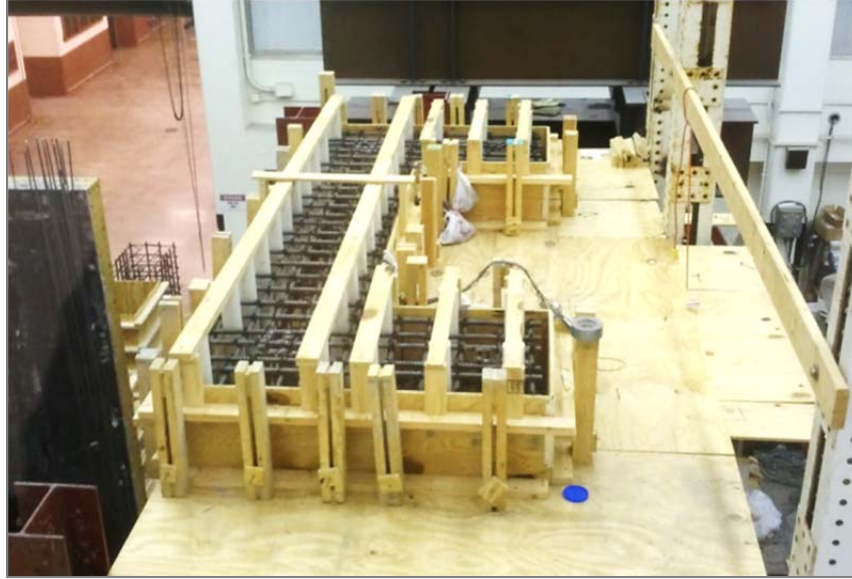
Rebar mats and completed formwork for Wall 7 cap
